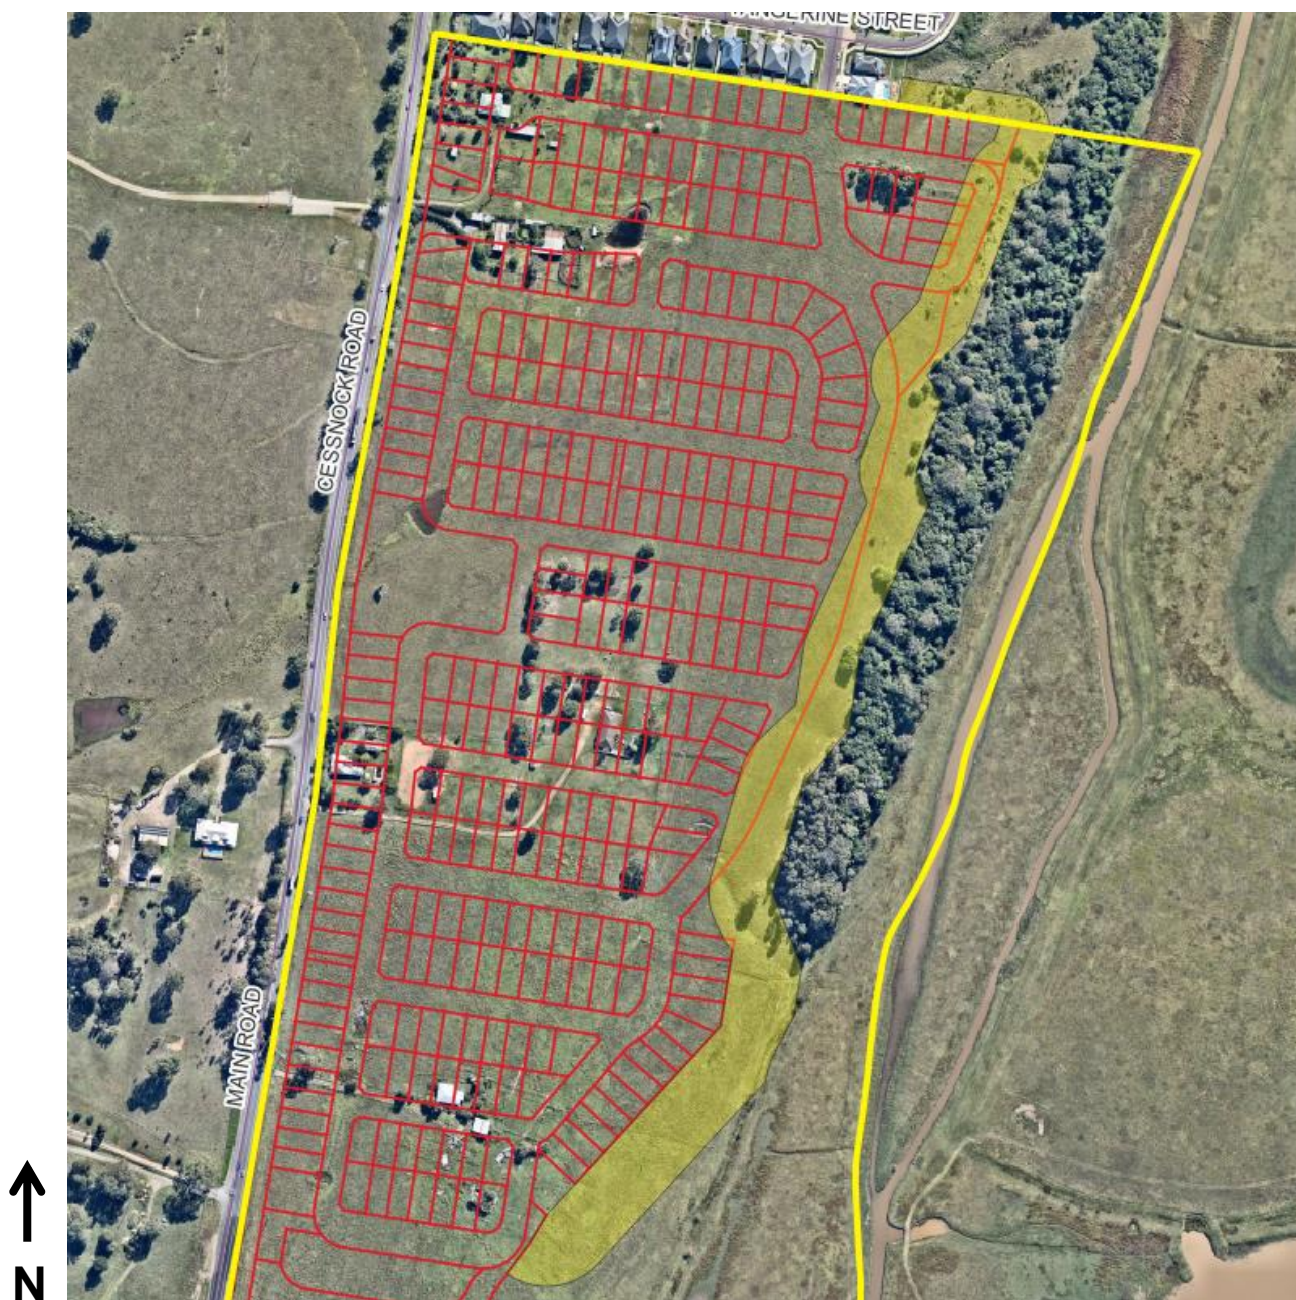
Proposed subdivision plan overlaid with enforced APZs
